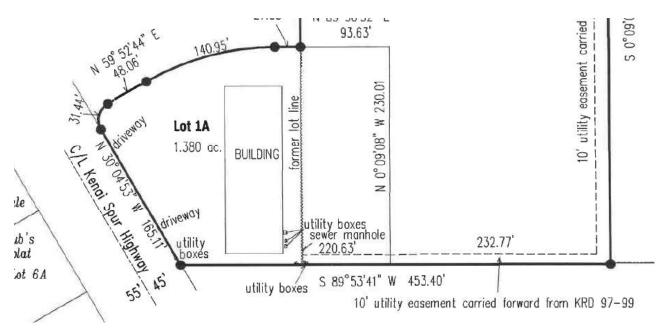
The preliminary plat depicts privately owned sewer manhole and utility boxes on Lot 1A.
